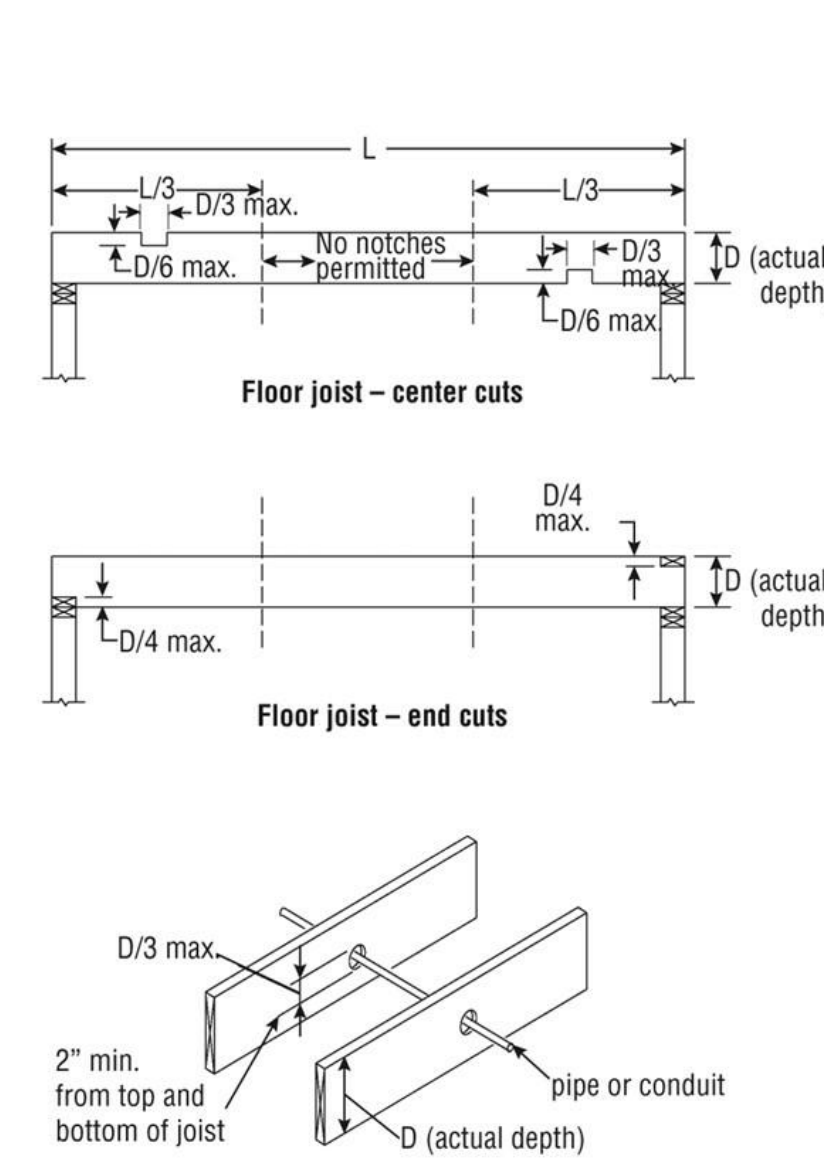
CUTTING, NOTCHING AND DRILLING
